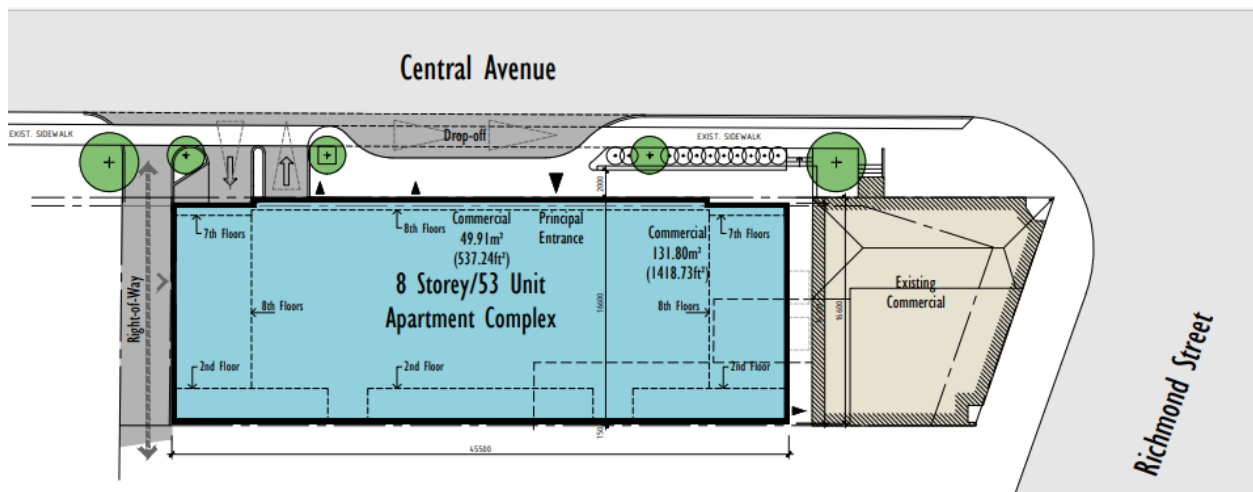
Excerpt of draft site plan (Source: R. Tomè and Associate, 2020)
